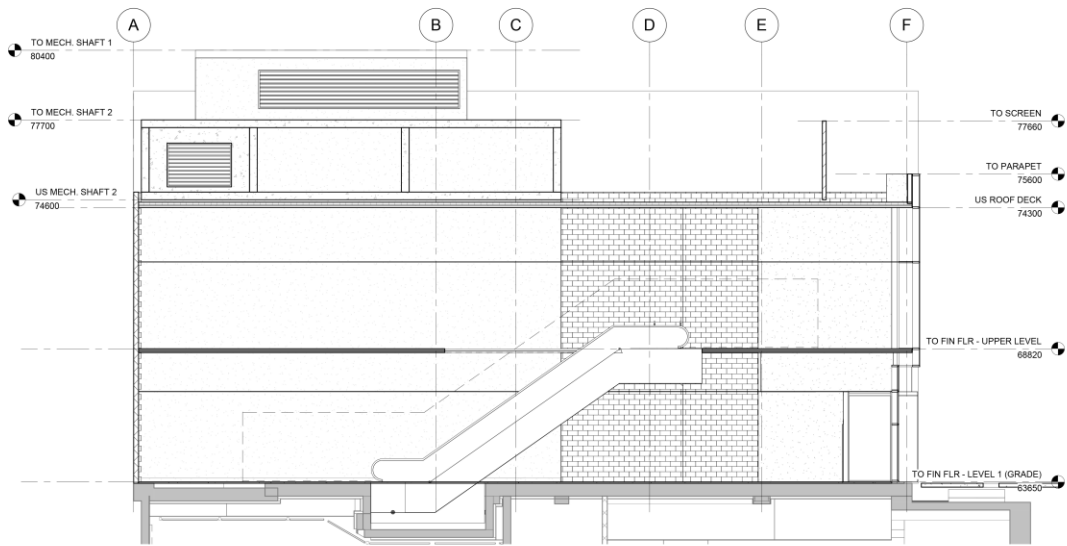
Longitudinal section for proposed infill building at 117 Rideau St. (Source: IBI Group, 2016)
